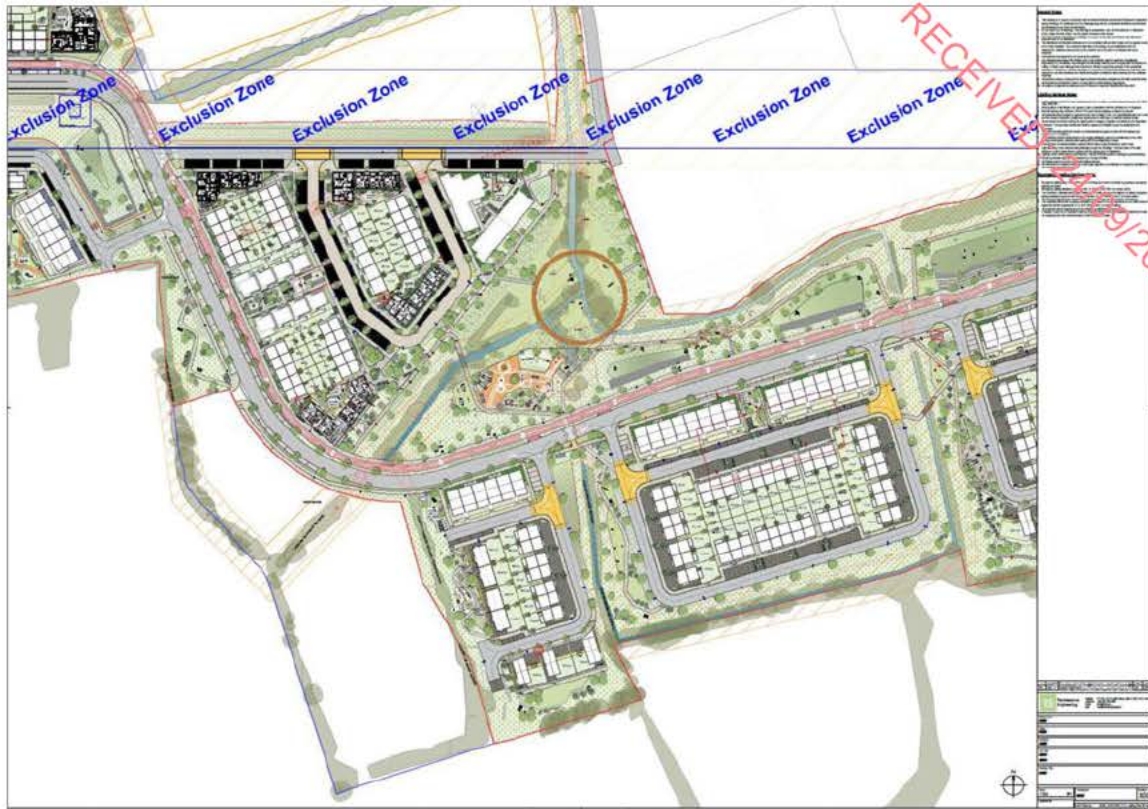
Central Proposed Lighting Plan (source: Renaissance Engineering, (2024)).
